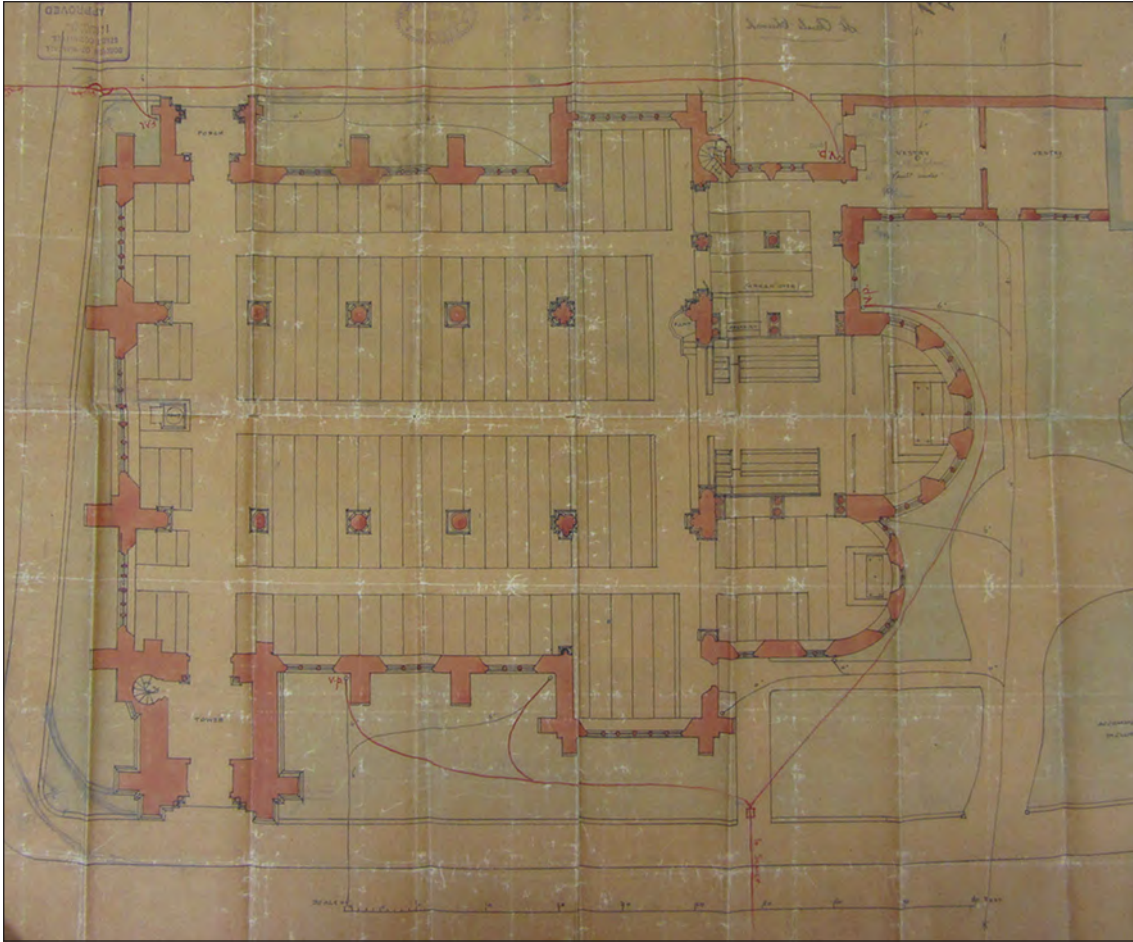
Ground-floor plan of the Church of St Paul, dated 1891 (Building Control plan no. 2552 © Walsall History Centre and the Church of St Paul)
